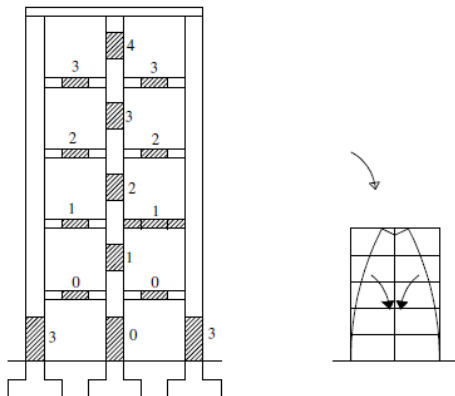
Layout of the delay system in a building intended to collapse into itself [16].
